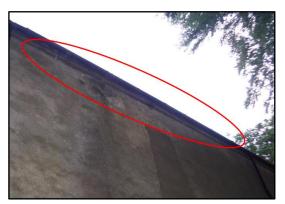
Example of deteriorating masonry at wall head and under guttering.
